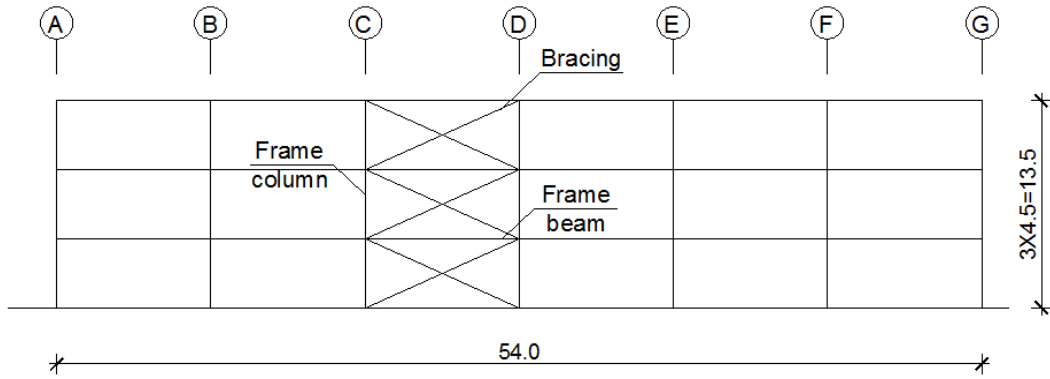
Model building elevation - 3-story CBF, $q = 1.5$
